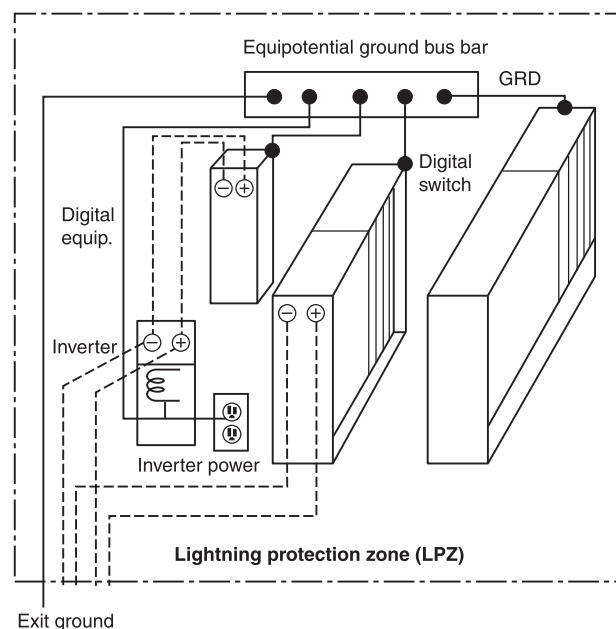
Illustration of an Equipment Room.
